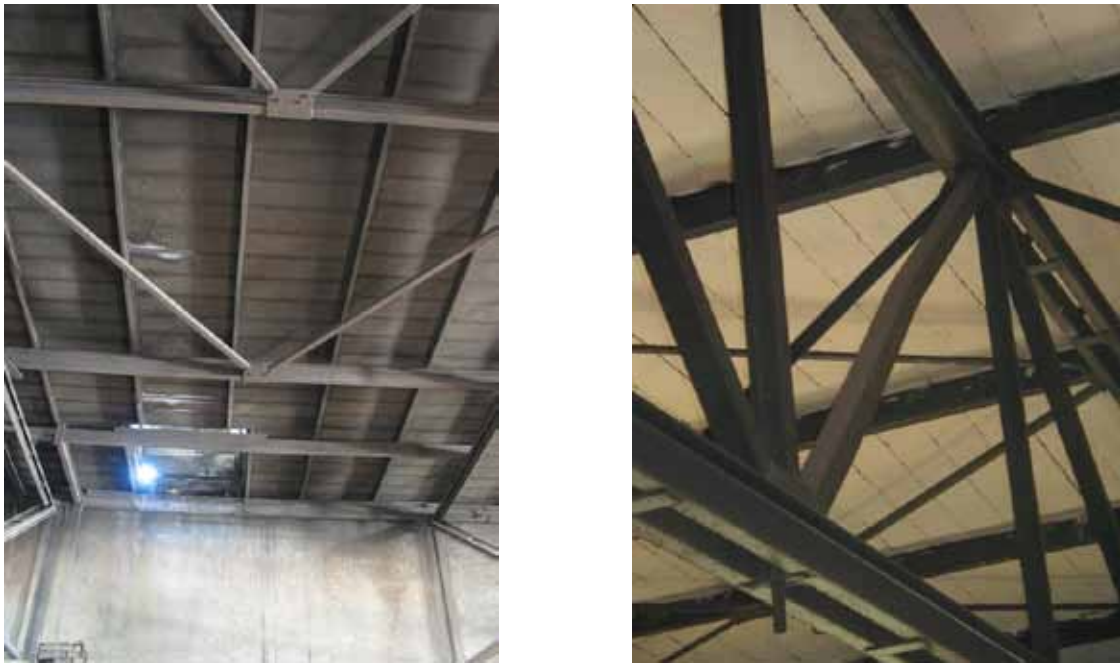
(a) In the renovation of the roof structure, bracing diagonal members were removed without being replaced. Owing to this change the bracing lost its load-bearing and bracing function [3].
